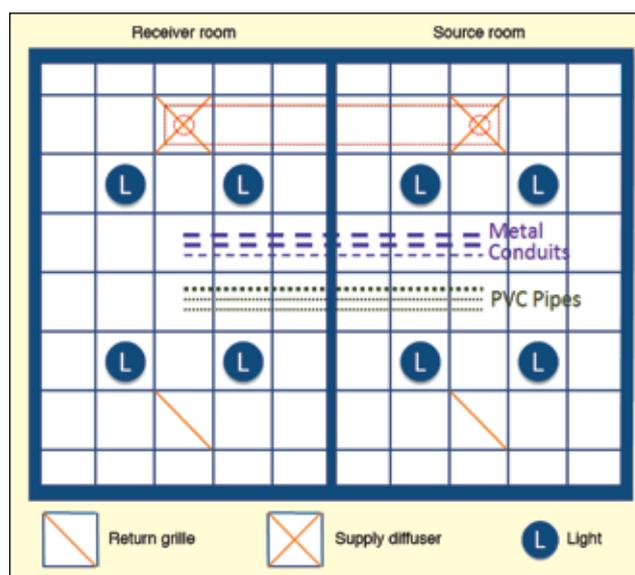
Reflected ceiling plan showing locations of lights and air devices during tests.
